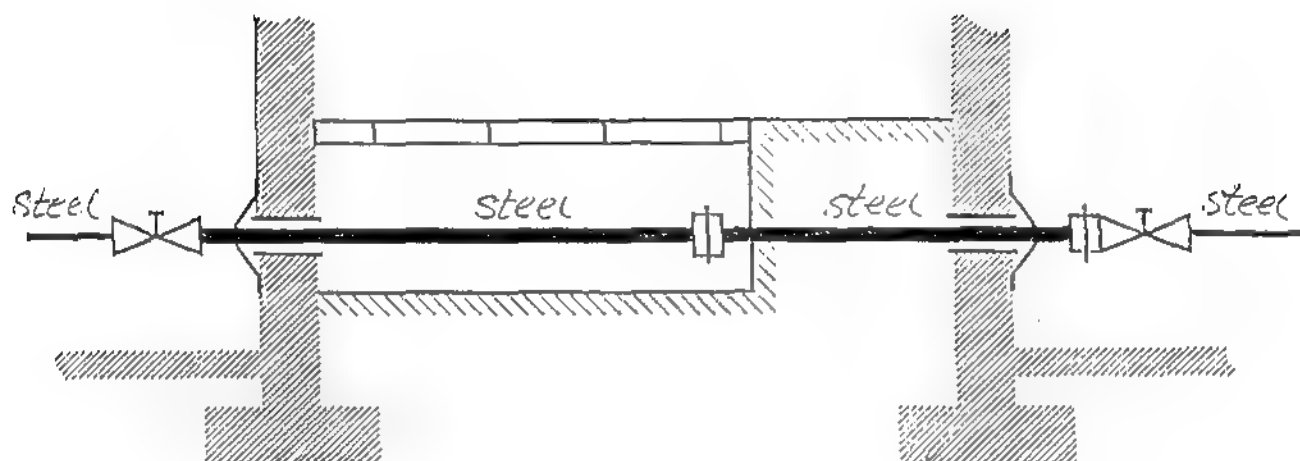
Insulating joints in detached control box and/or meter case made of metal or concrete (foundation made of reinforced concrete)
